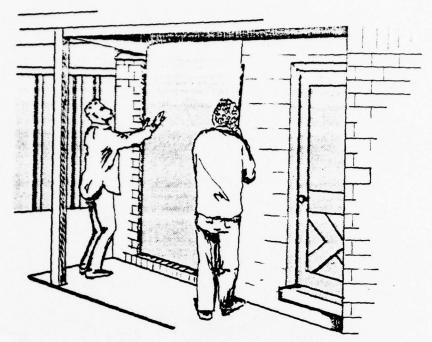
PLACING BOARDS OVER EXTERIOR WALL APERTURES.
